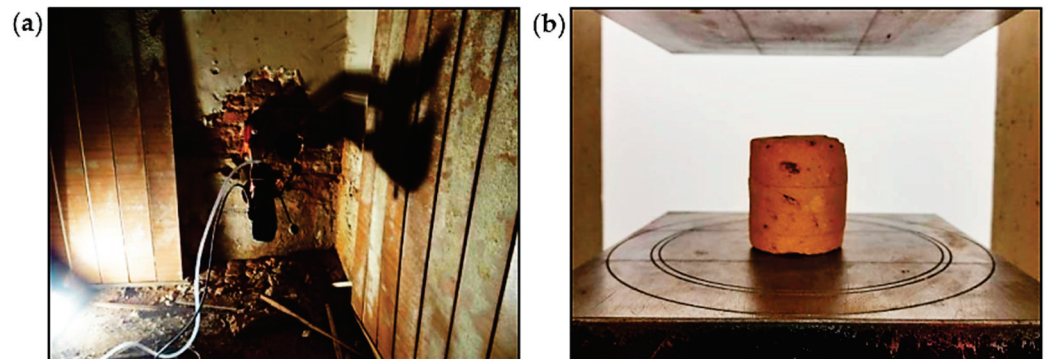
Destructive testing: (a) cutting out brick samples from the wall and (b) the strength test of a brick.
